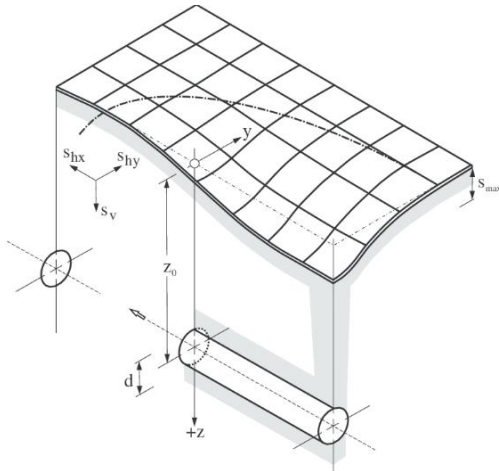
Three-dimensional ground settlement due to tunnel excavation.
